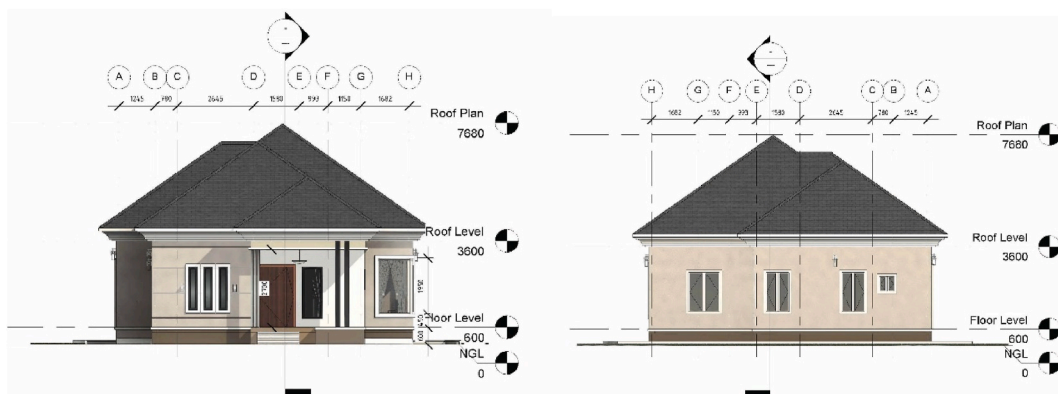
A South and North Elevation view of the Proposed 3-Bedroom Bungalow.
